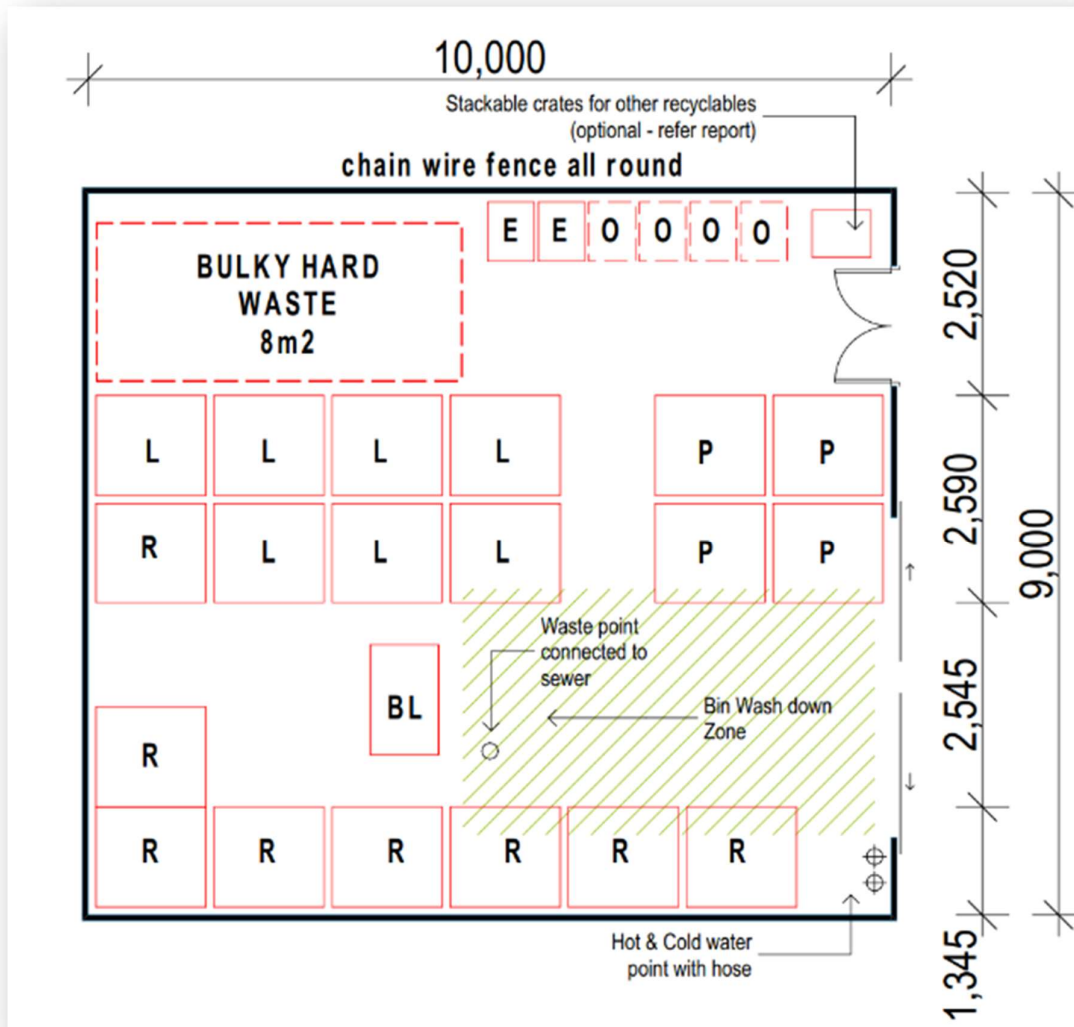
Bin store layout plan (Source: LID Consulting Pty Ltd 2023)
